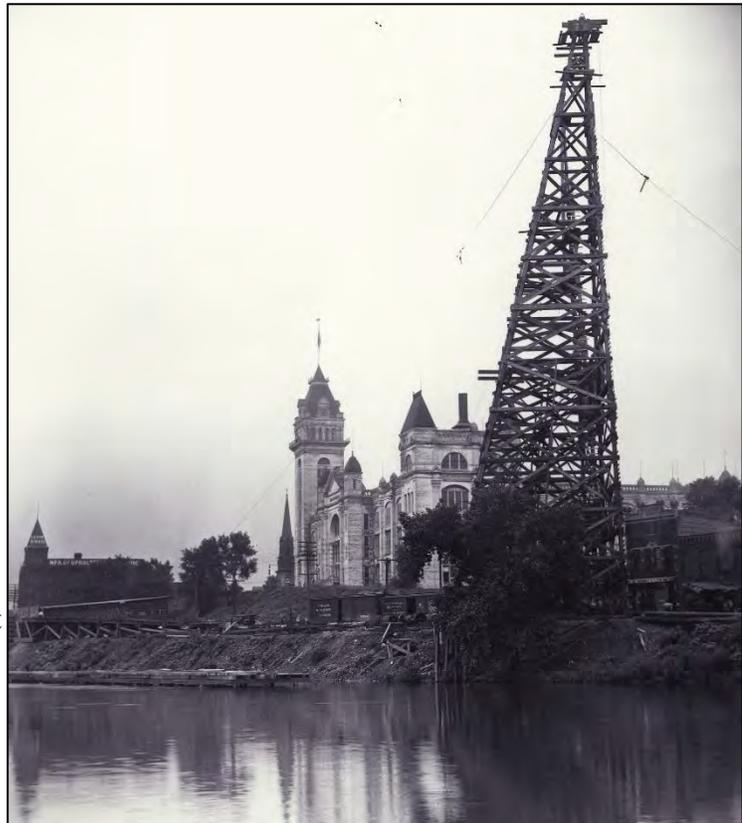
June 29, 1914 – Completed timber tower with part of the concrete plant visible, on the east bank, looking northwest
